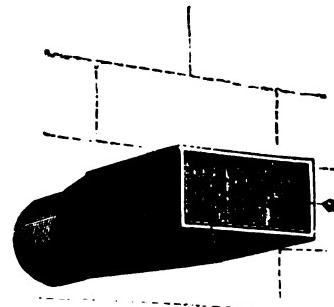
Double mica flap-valve for horizontal air inlet.
